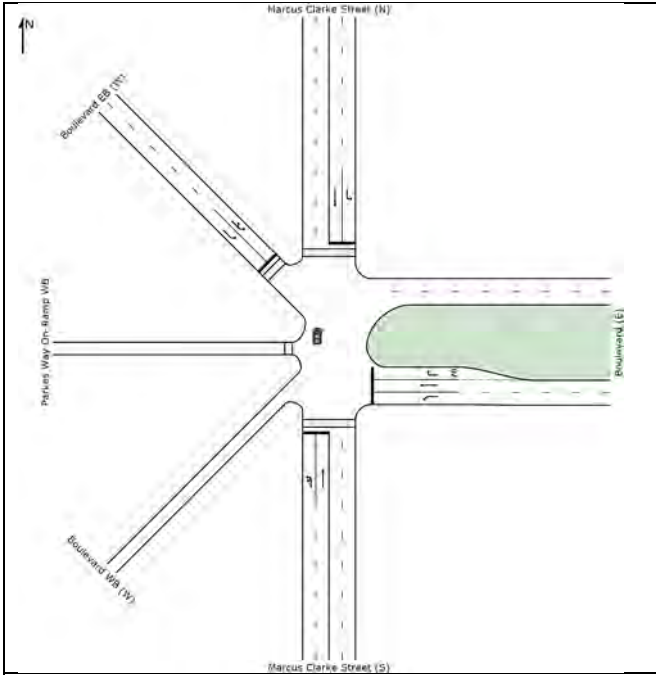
Variant 2c Parkes Way Boulevard – Marcus Clarke Street Intersection
